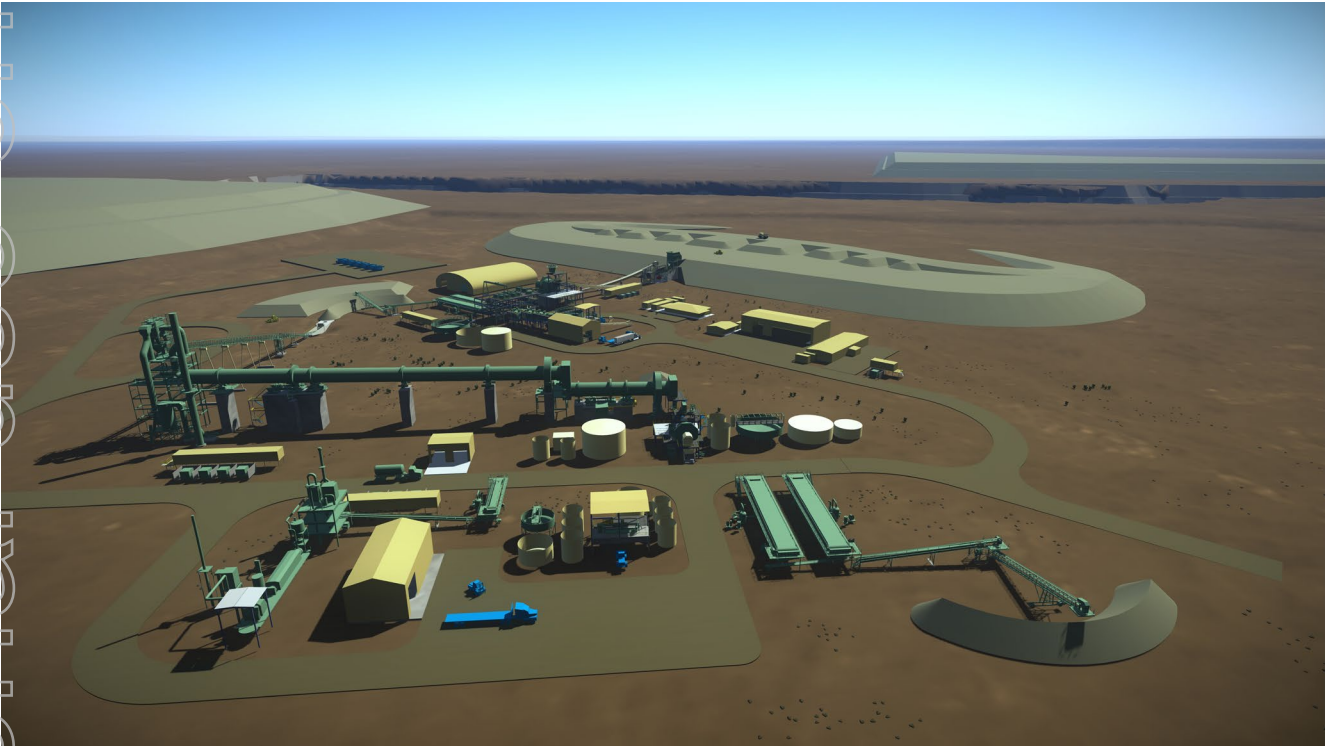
Plant Layout (Aerial view looking east. Processing plant in the foreground, IWL to the left (north). The ROM blending stockpiles are visible behind the plant and the Gabanintha open cut (3.2 km long) is in the background. A second waste dump is located east of the pit.
